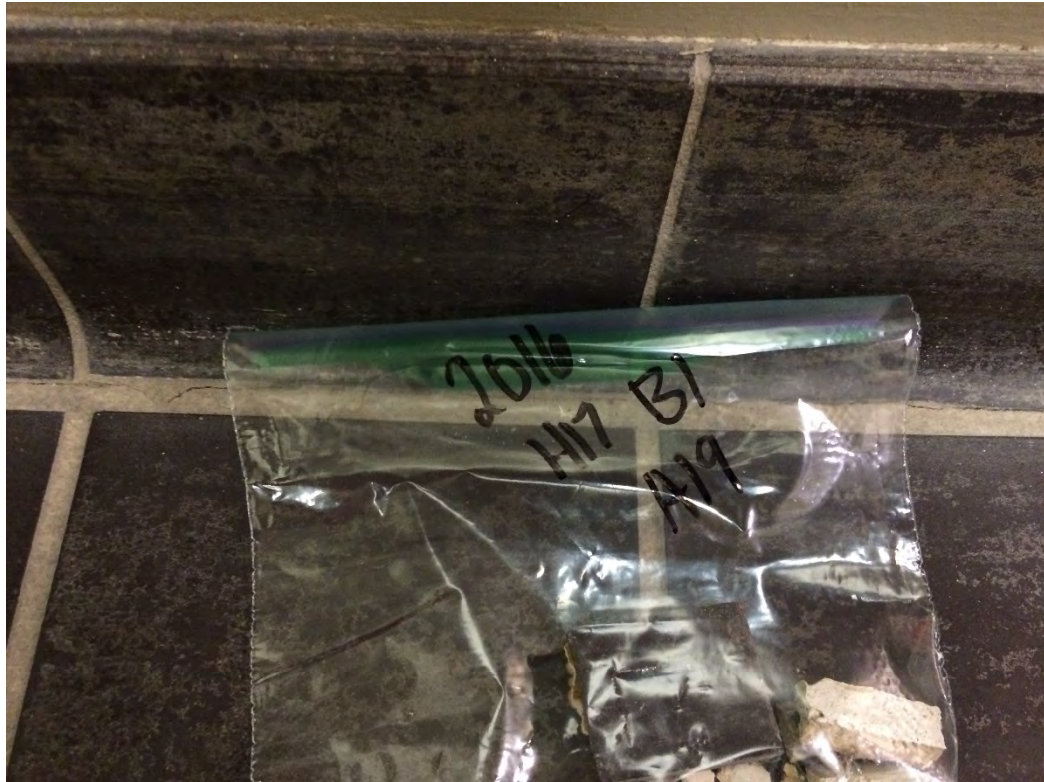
Asbestos sample A19, dark grey ceramic floor tile, grout and adhesive collected from H17-B1. No asbestos detected in the tile, grout or adhesive.
